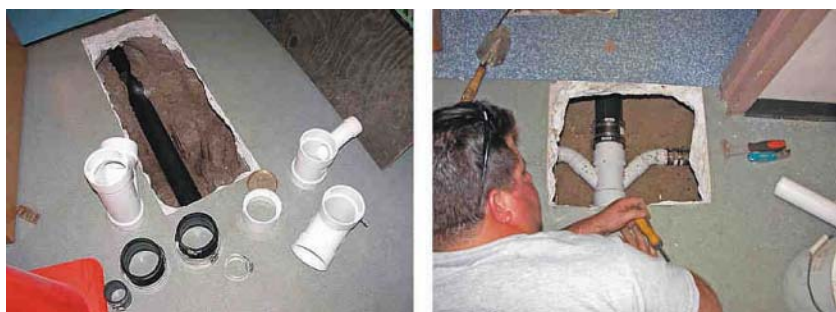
Reconnecting New Pipe with Existing Pipes. Left: Fittings, Rubber Couplings and Stainless Steel Shear Bands. Right: Connection Completed (Tric Trenchless Inc).
